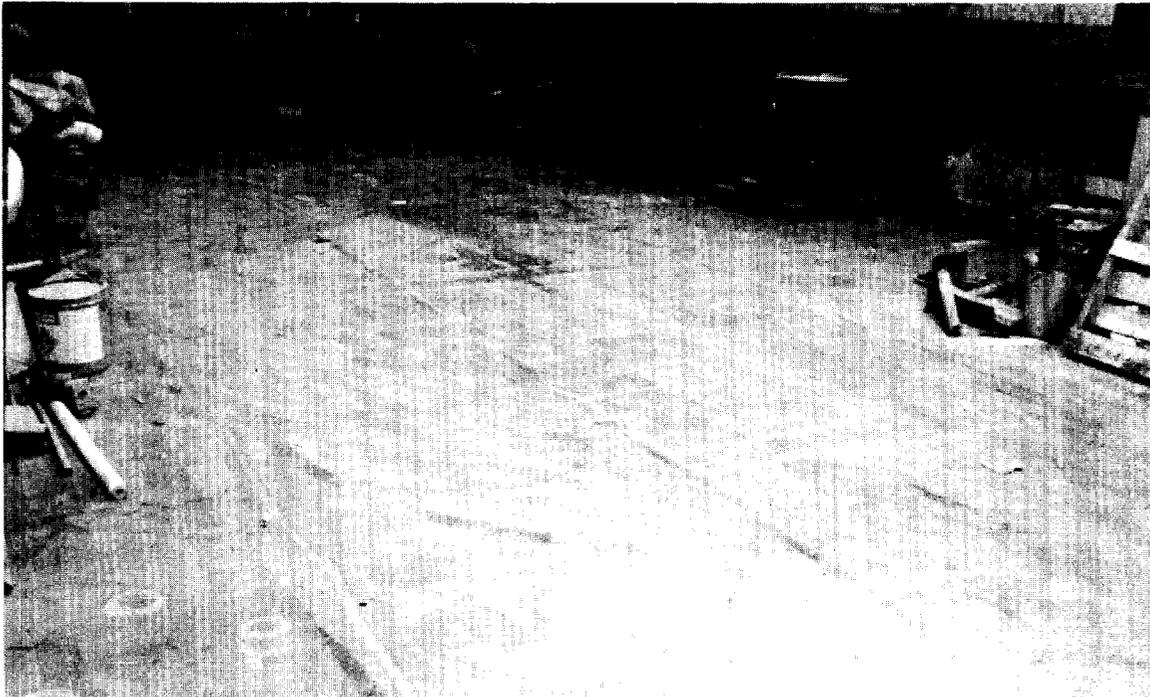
Dynapack room (Room 6), looking southwest toward location D4 from C3.
